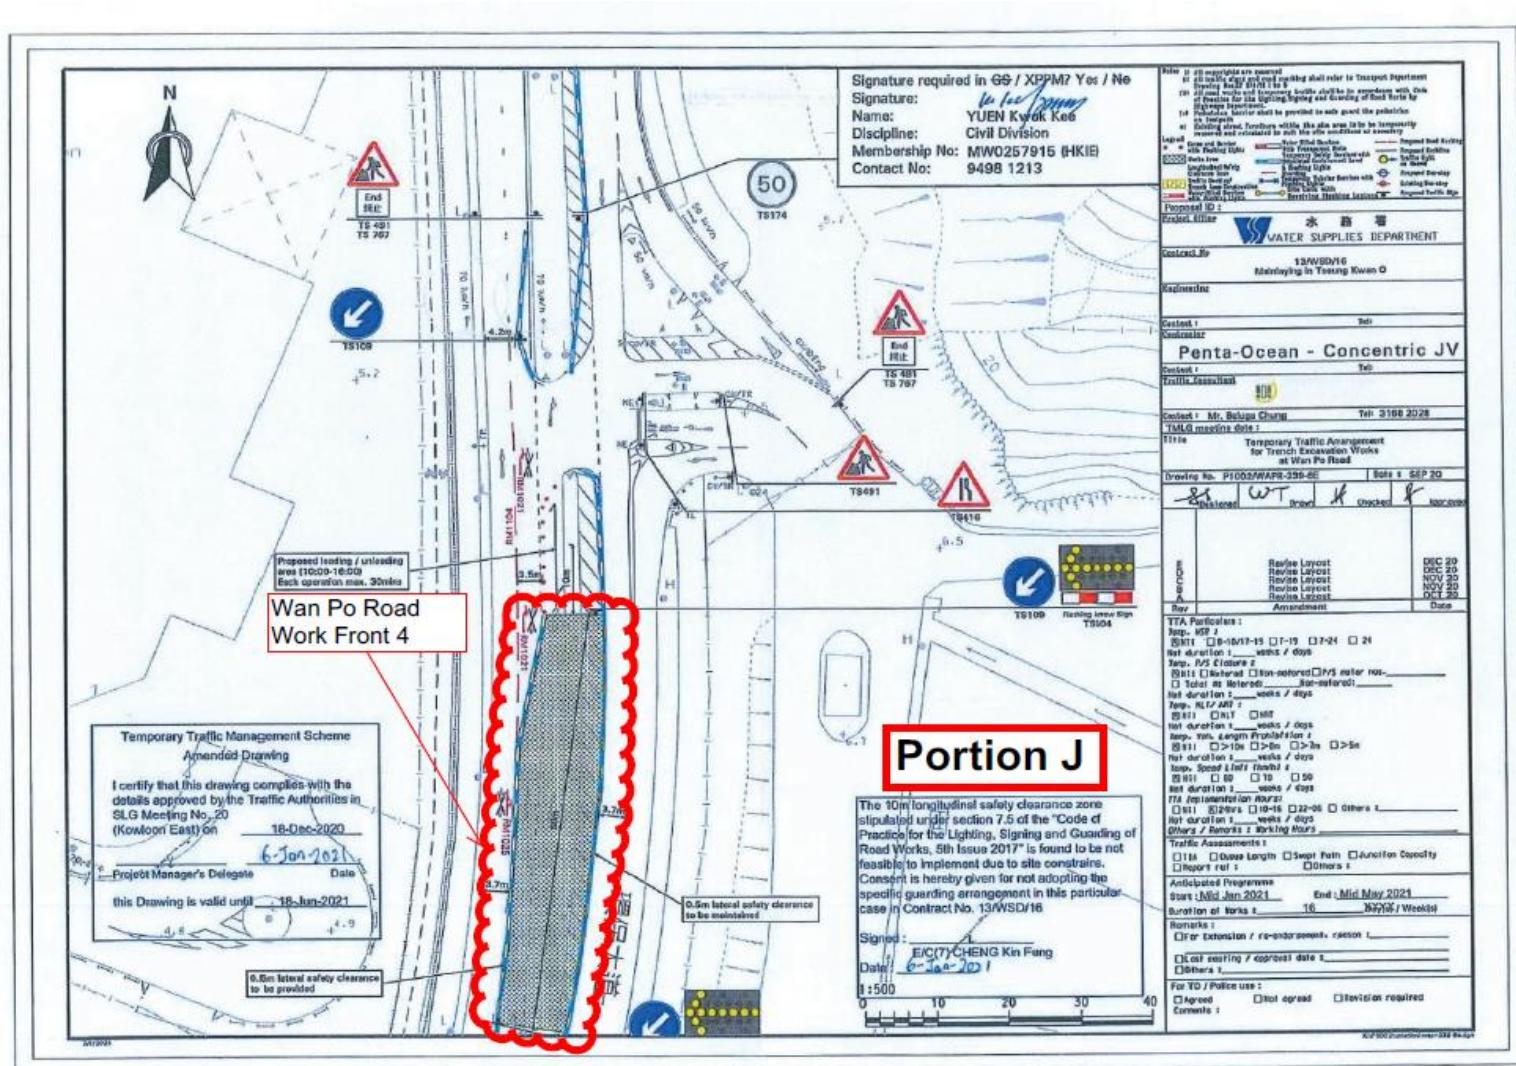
Location Plan for Portion J – Wan Po Road 4
